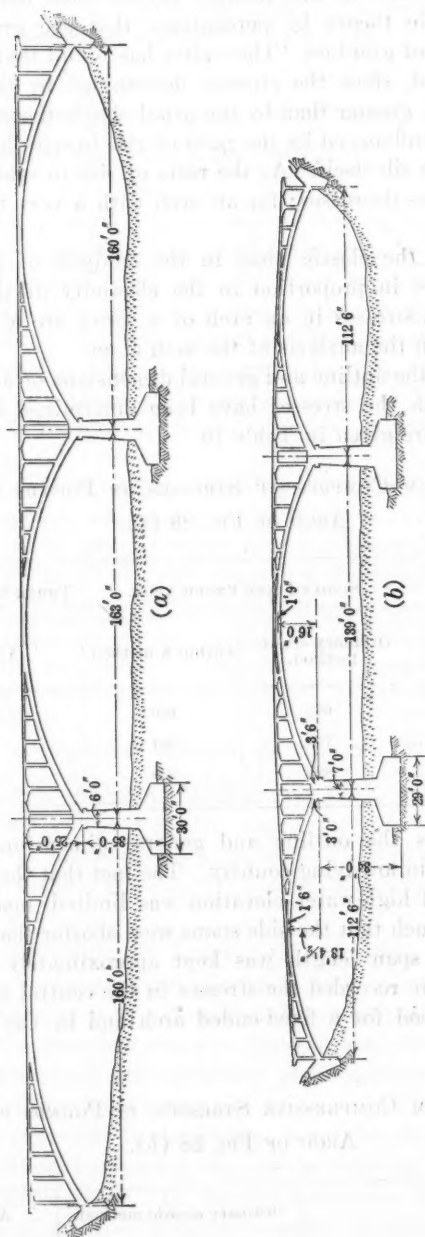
ELEVATIONS AND DIMENSIONS OF TRIPLE ARCH BRIDGES.
